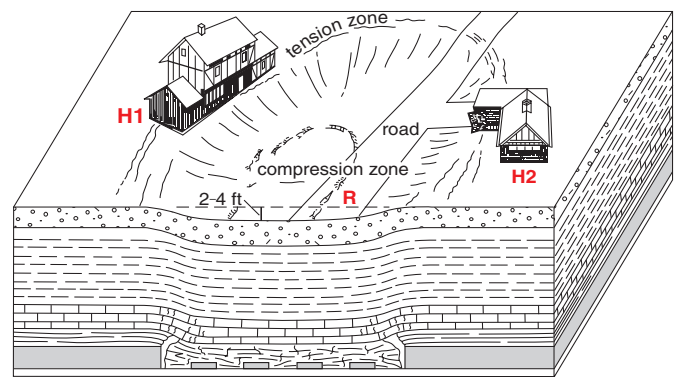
Block diagram of a typical sag subsidence event. The road is in the compression zone (located at R), and asphalt has buckled. The wood frame house (H1) is in the tension zone; the house's foundation has pulled apart and dropped away from the superstructure in one corner. A brick house (H2) in the tension zone shows cracks in walls, ceilings, and floors.
